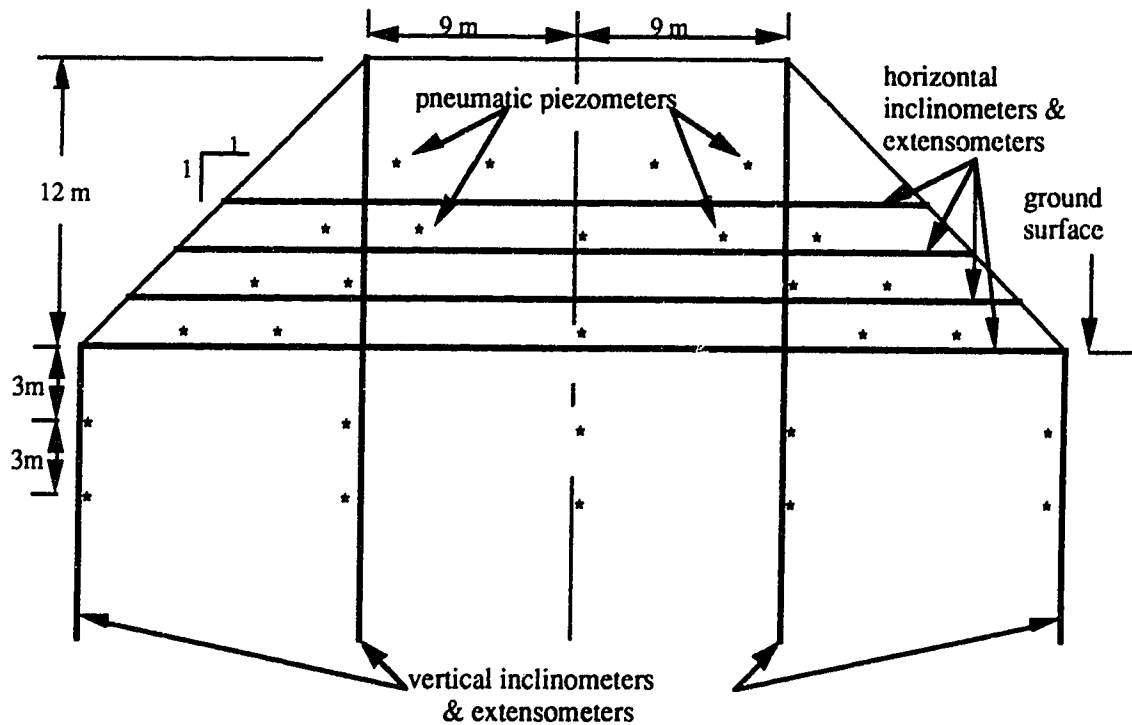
Layout of Soil Instrumentation in Devon Test Fill
